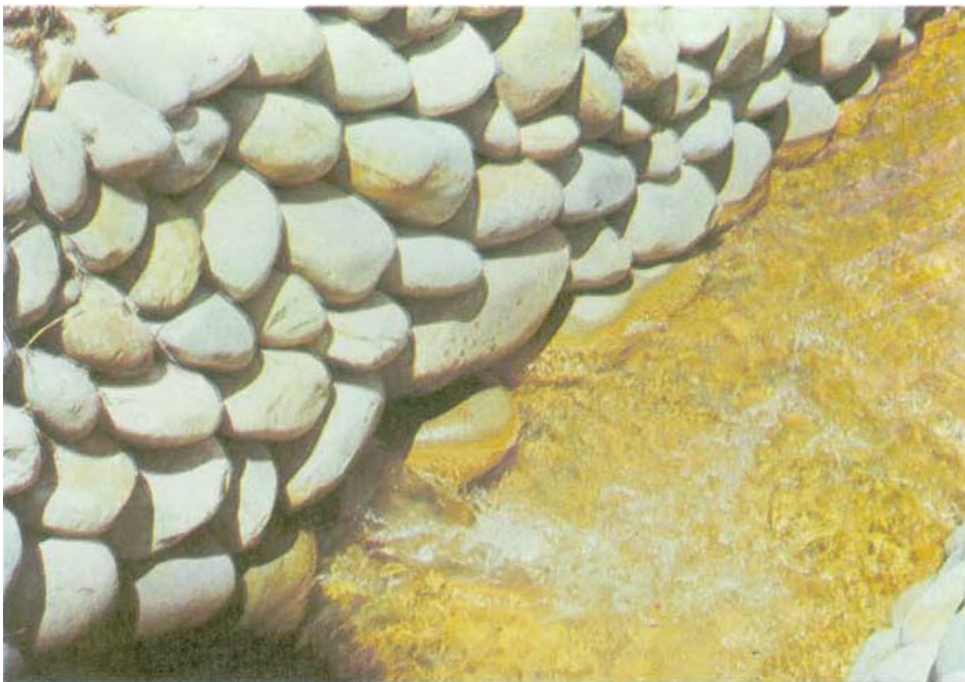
Draining of excessive water from an underground drainage pipe in an acid sulfate soil into a drainage ditch.
